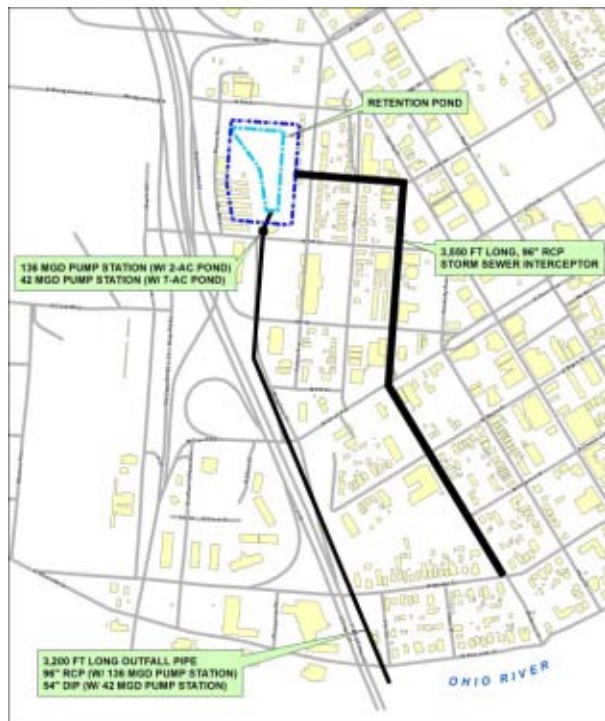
General Layout of Storm Sewer Interceptor Alternative
